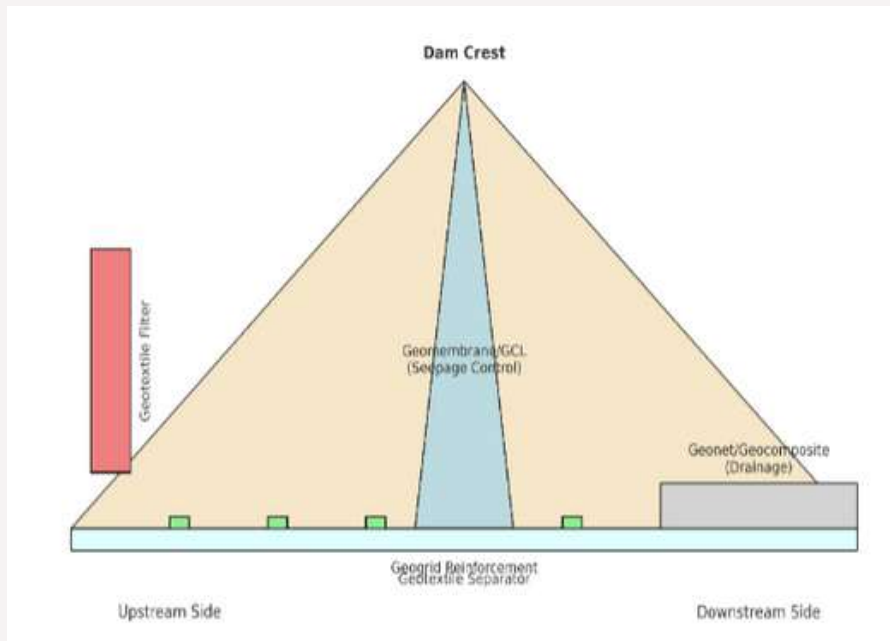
A schematic cross-section showing multiple geosynthetics applications within an embankment dam
